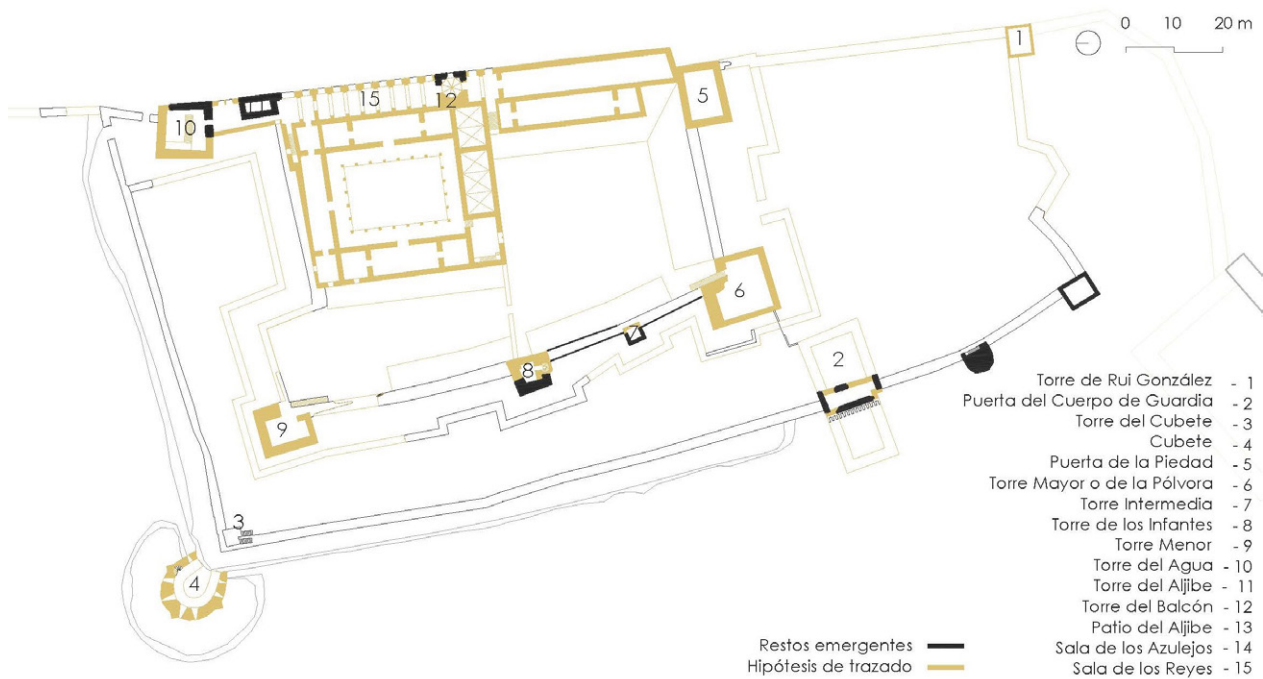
Upper floor plan of the Alcázar. Source: the authors.
